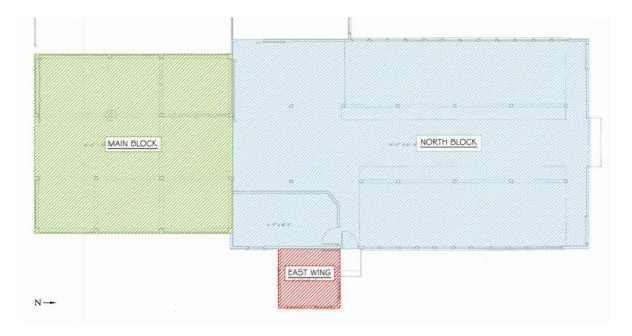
B-5. Barn Sections Key Plan, overlaid on HABS drawings (not to scale).
